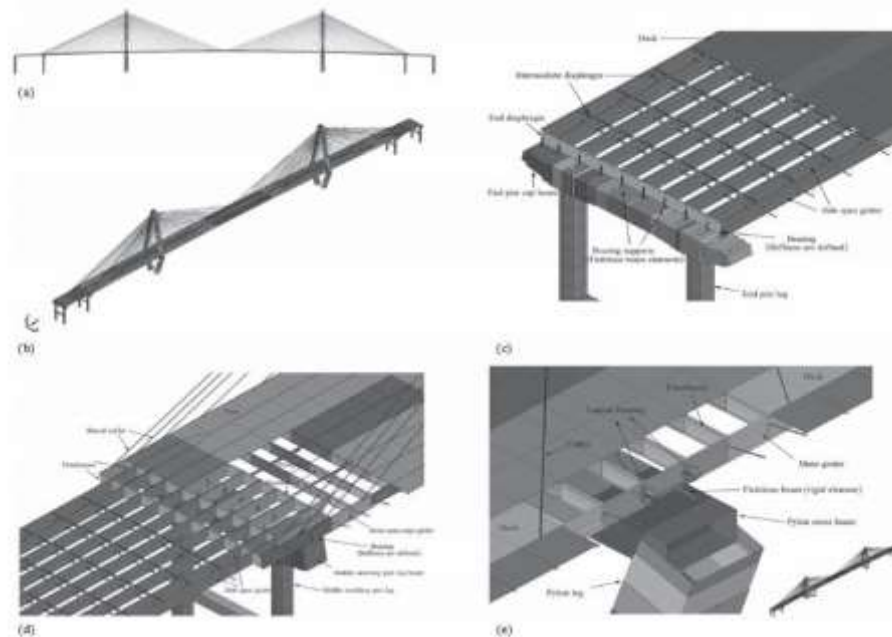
FEM of the prototype bridge: a) elevation view; b) isometric view; c) components information near end pier; d) component information near the auxiliary pier; e) component information near pylon leg.
